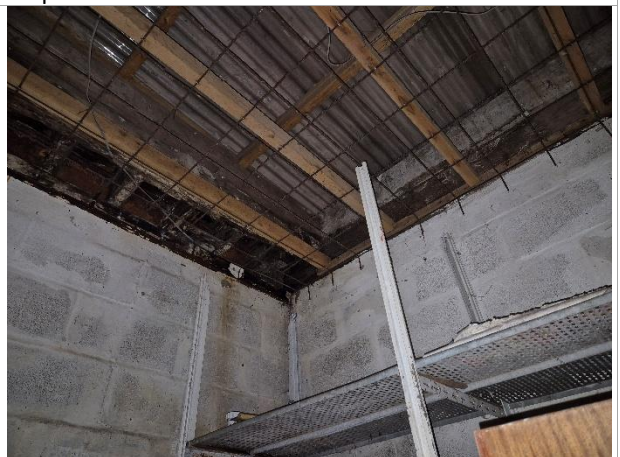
Beneath ceiling at flat roofed section. Timber planks at wall tops cover any holes at the top of the concrete block wall
